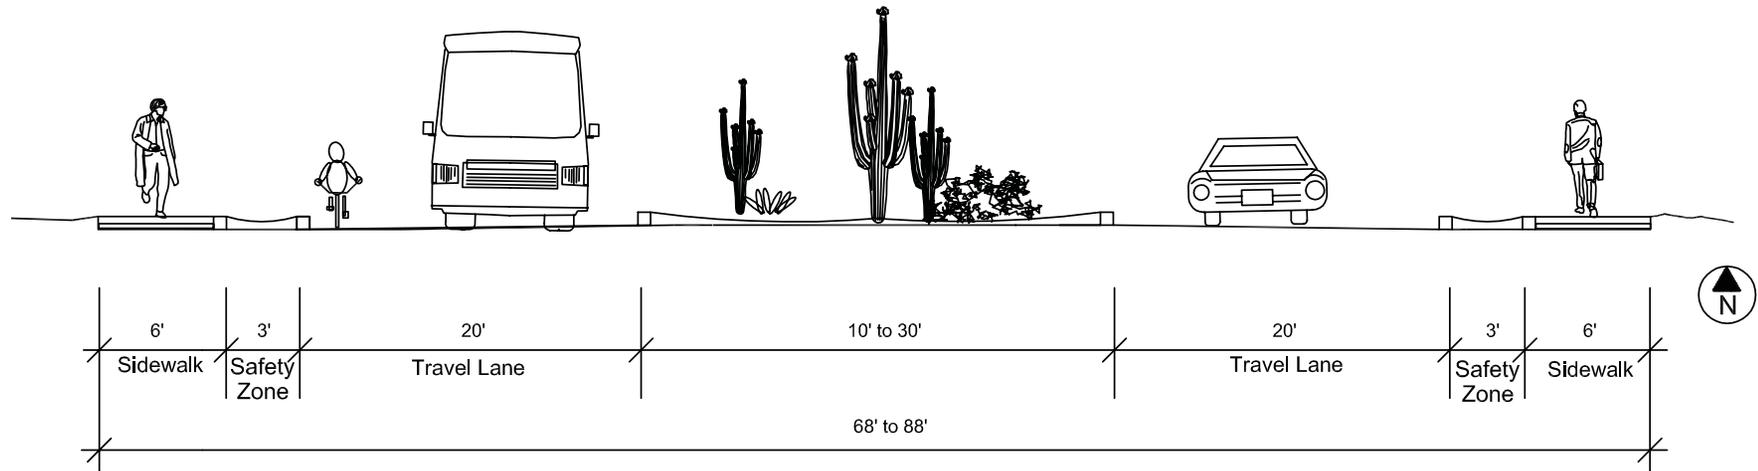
A - Street Section: New Craycroft Entrance and Entry Bridge over Alamo Wash
